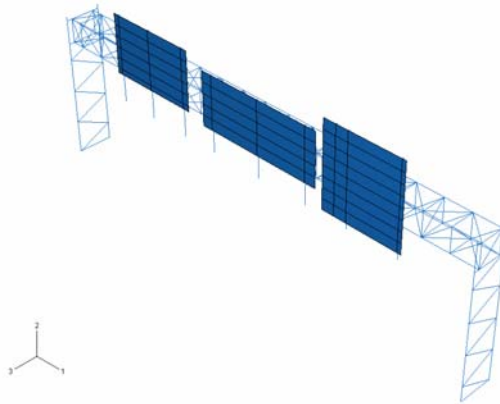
Revised Sign Bridge Model without Horizontal Arms, Lights and Walkway
